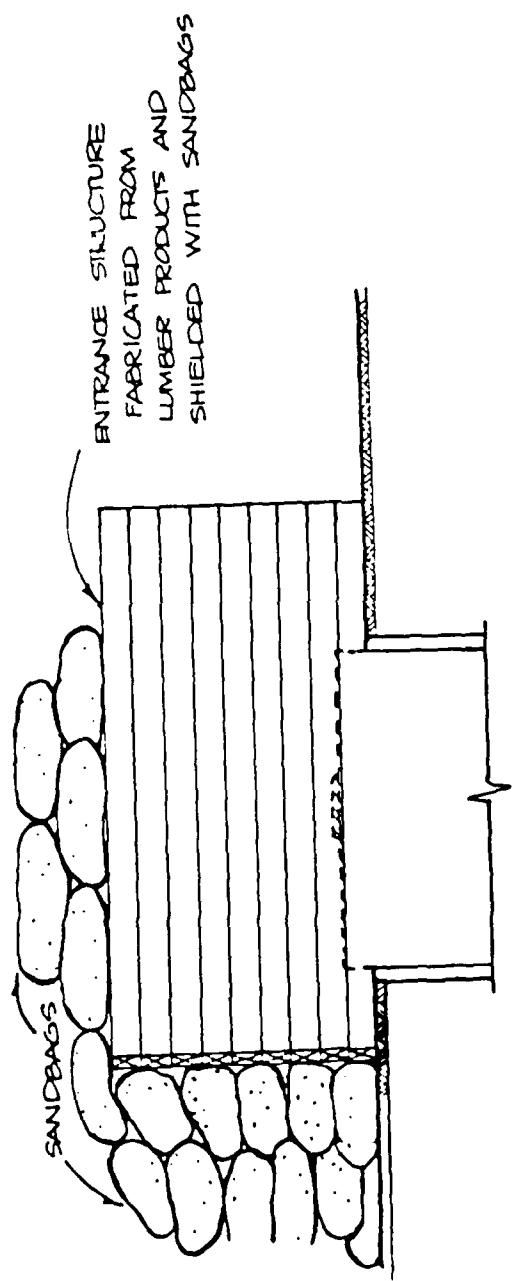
Radiation Protected Entrance Structure to Below Ground Shelters.
